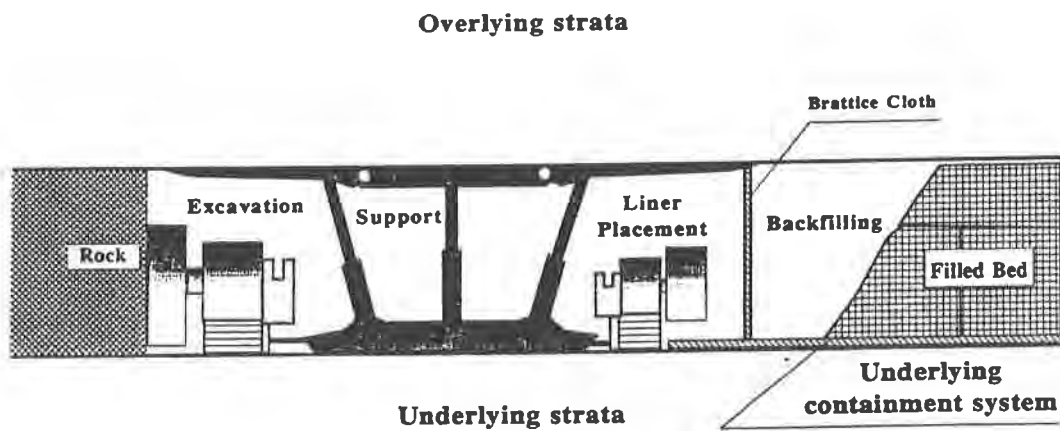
Profile of the roof support shield, mining shearer, placement of the hydraulic barrier, liquids collection system and backfilling operation.
